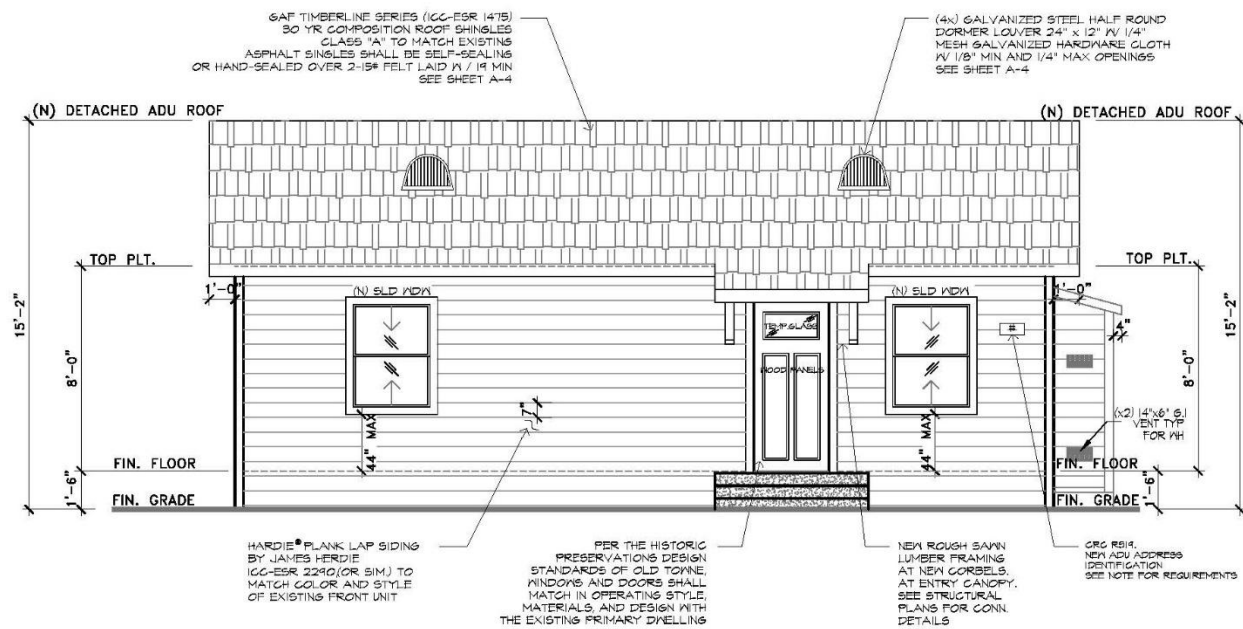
Proposed ADU, primary elevation (not to scale; Allstar Design and Engineering Group)
